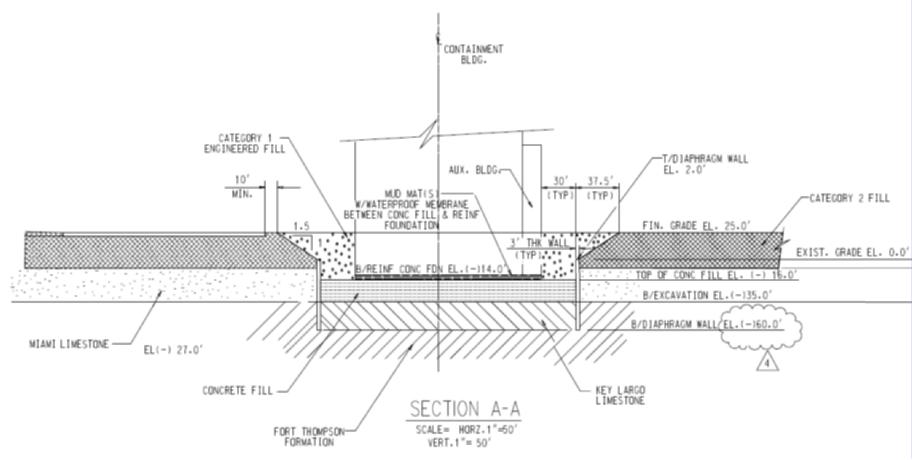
TPNP Unit 7 Excavation Cross-Section (Reference 4)
